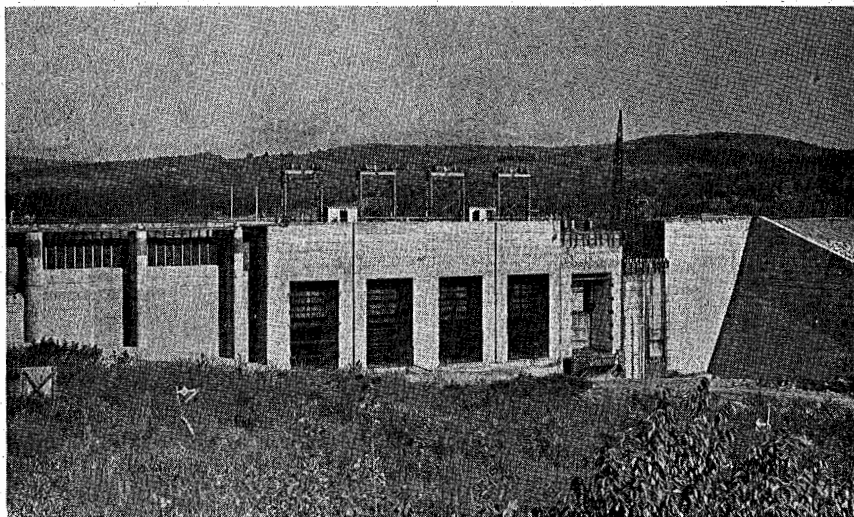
INTAKE AND NON-OVERFLOW STRUCTURE DURING CONSTRUCTION.
